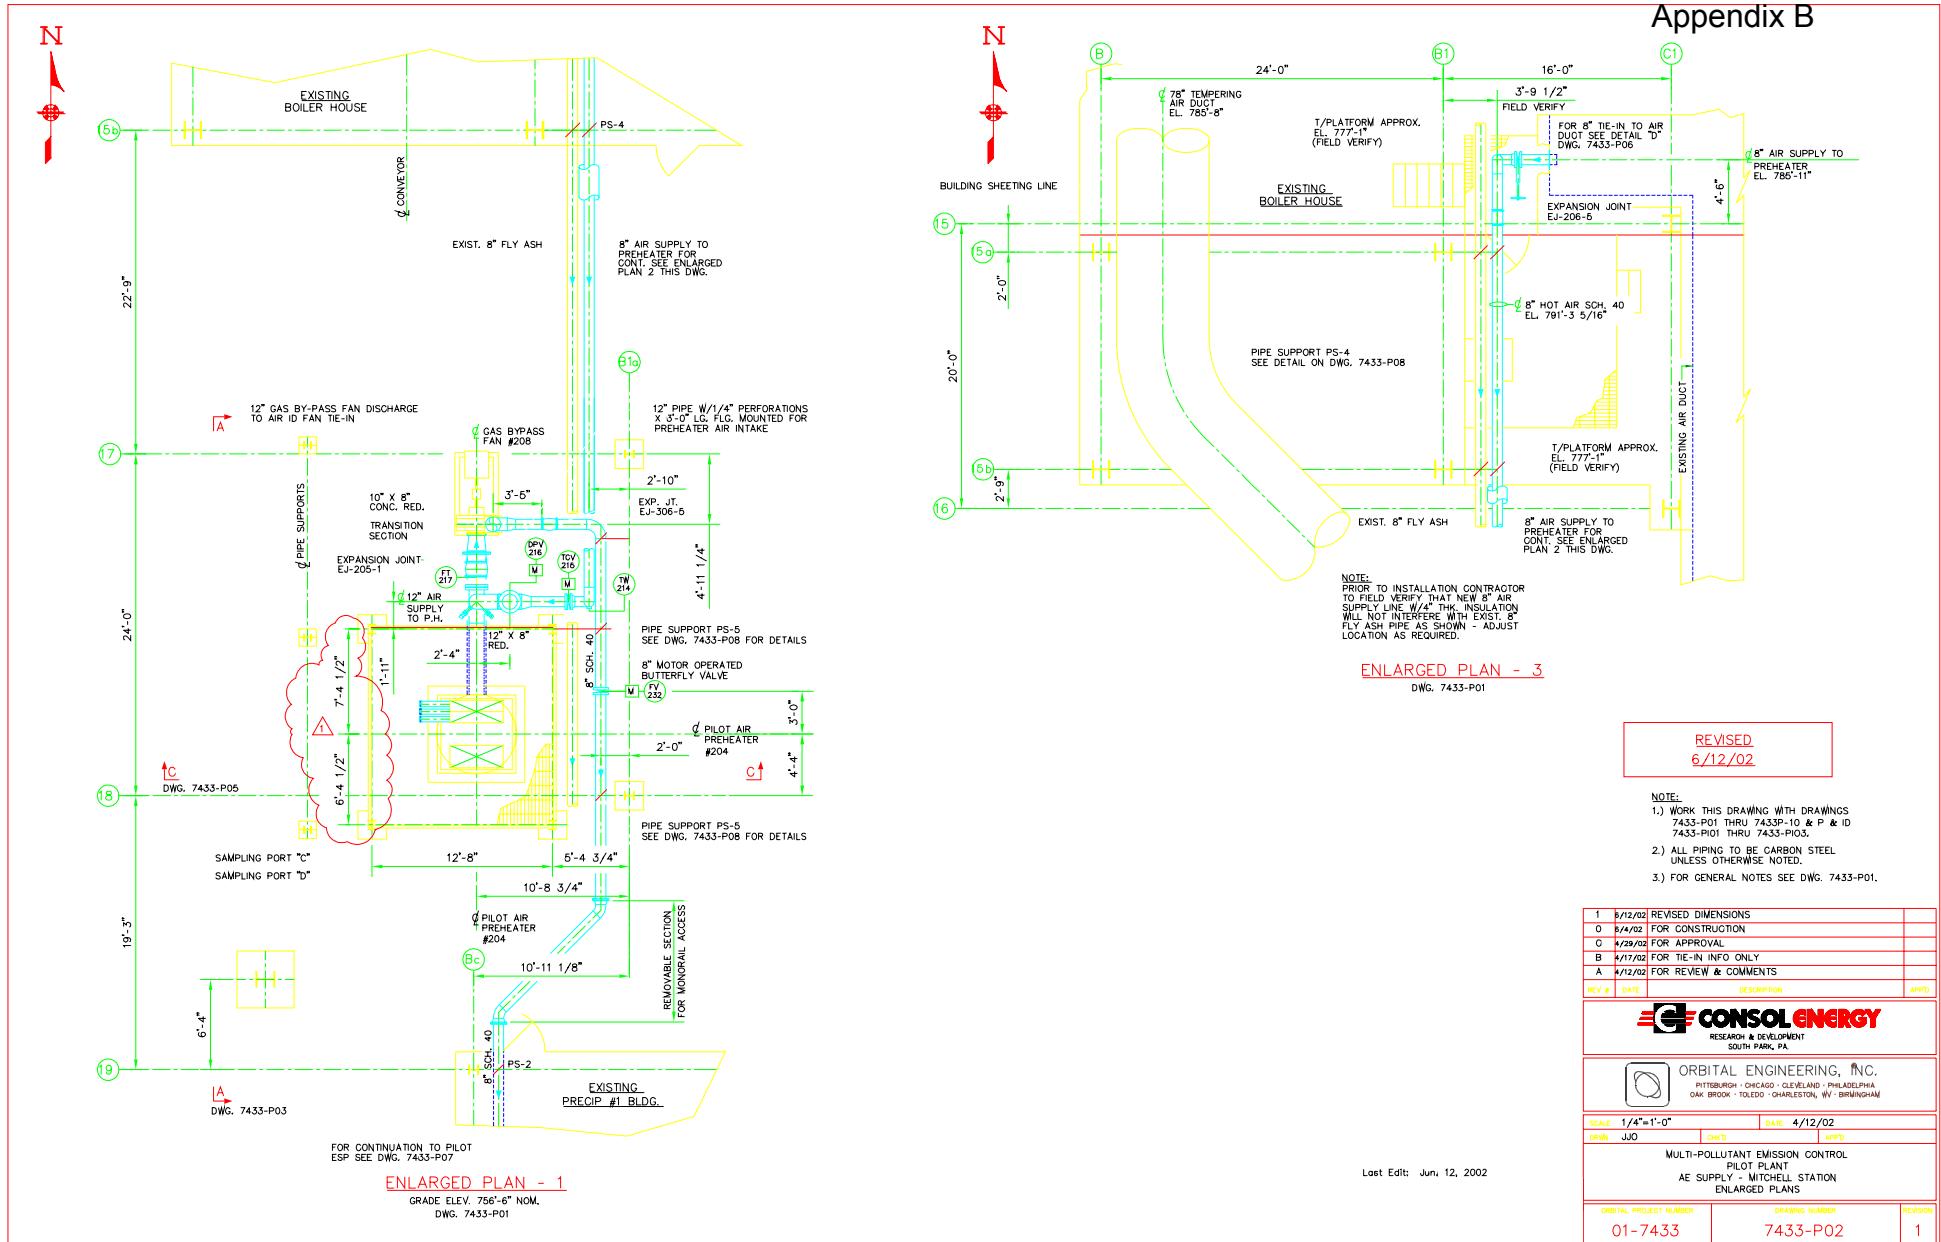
General Arrangement & Piping, Enlarged Plan View
